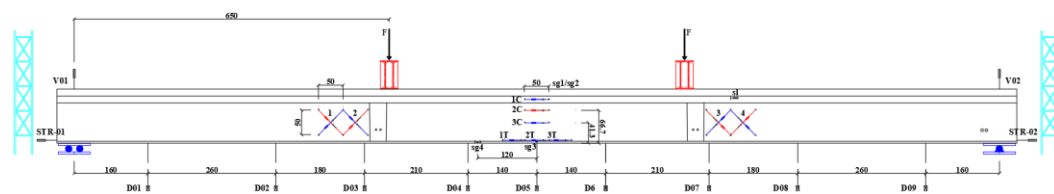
Test setup and layout of the monitoring system installed on Bx2-Ab/P47 girder (unit: cm).
